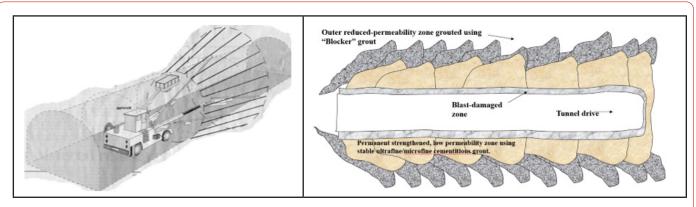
The fast-setting blocker grout principle illustrated in [7]. Three key advantages are a shortening of the setting time so that tunnelling can continue, 'protection' against unnecessary grout loss, and provision of containment when high-pressure injection is needed but the surface (or parallel excavations) is too close for comfort.
